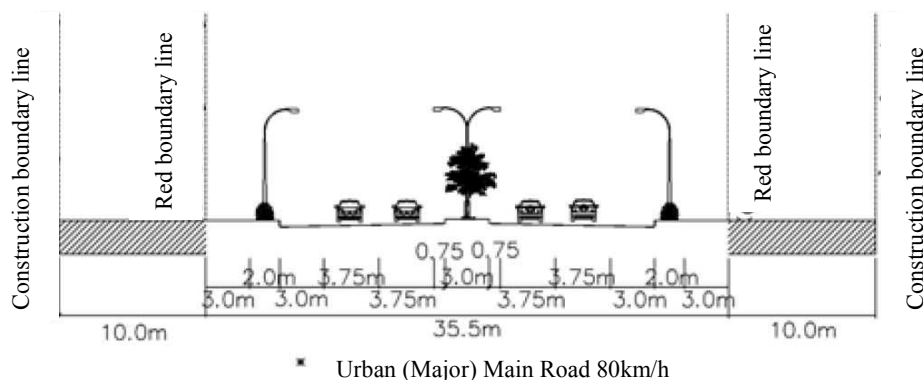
Typical road cross section of Ring Road No. 3 – without collector roads
